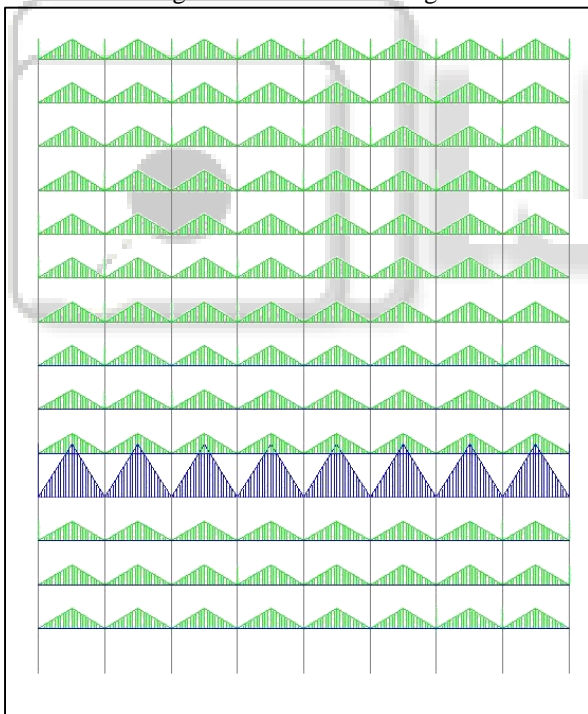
Mass Irregularity at 5th floor of 14 Storey Building.
